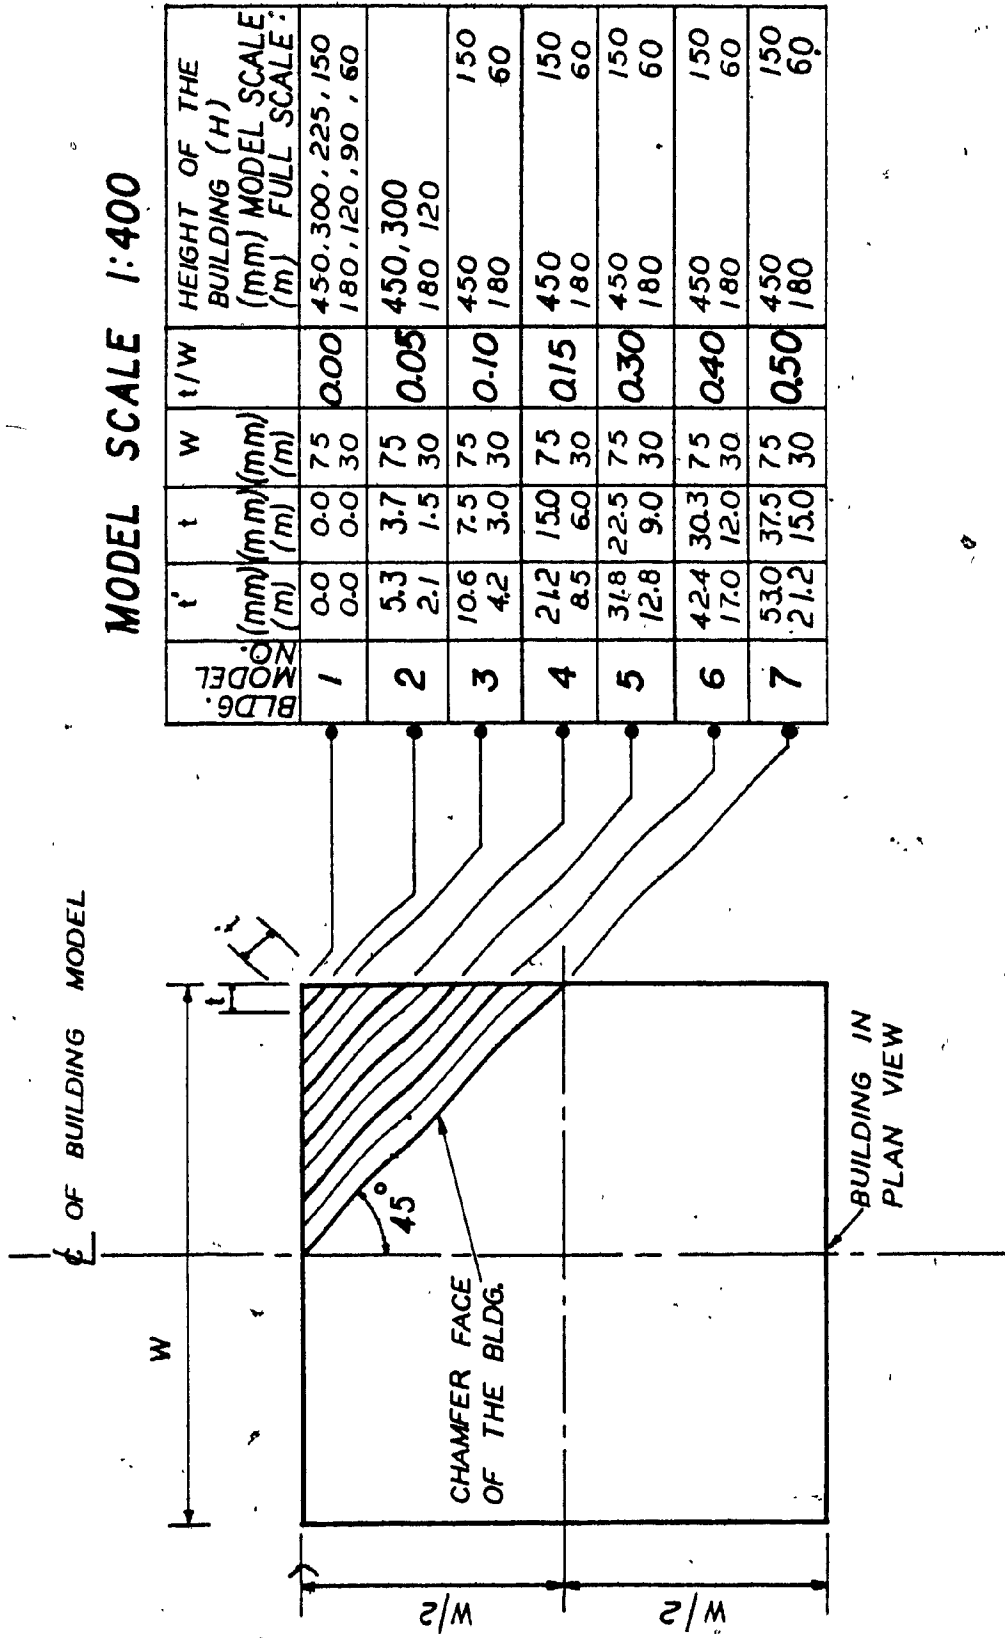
BUILDING MODEL CONFIGURATIONS
